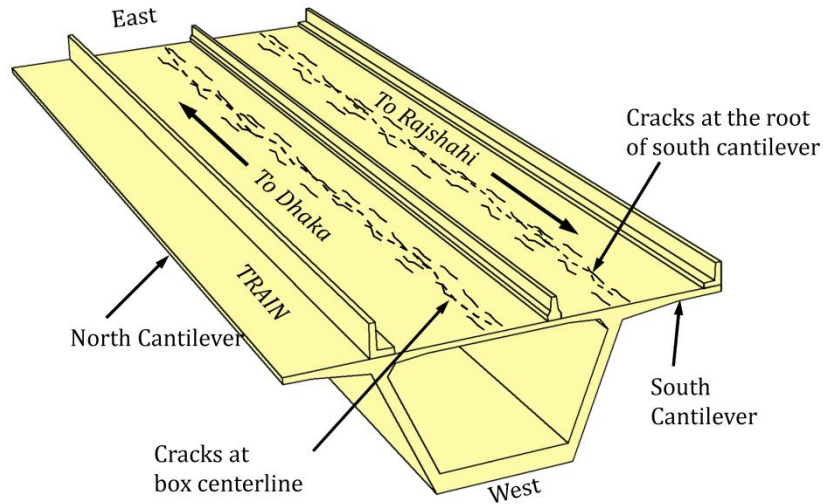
Schematic representation of cracks on the deck of Bangabandhu Bridge
